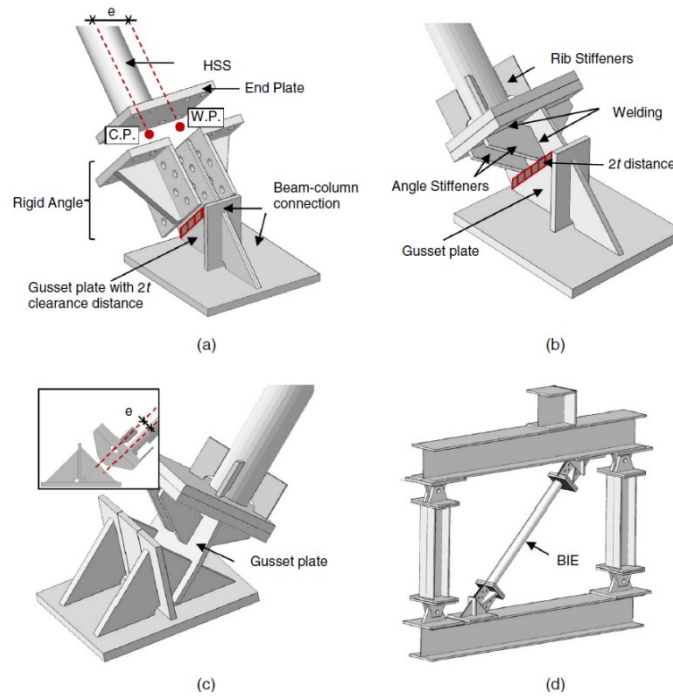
Typical details of Skalomenos et al. test specimens: (a) Out-of-plane end plate connection; (b) out-of-plane end plate connection with stiffeners; (c) in-plane end plate connection with stiffeners; (d) Specimen G1-OoP-60 connected to the loading frame (from [12])
